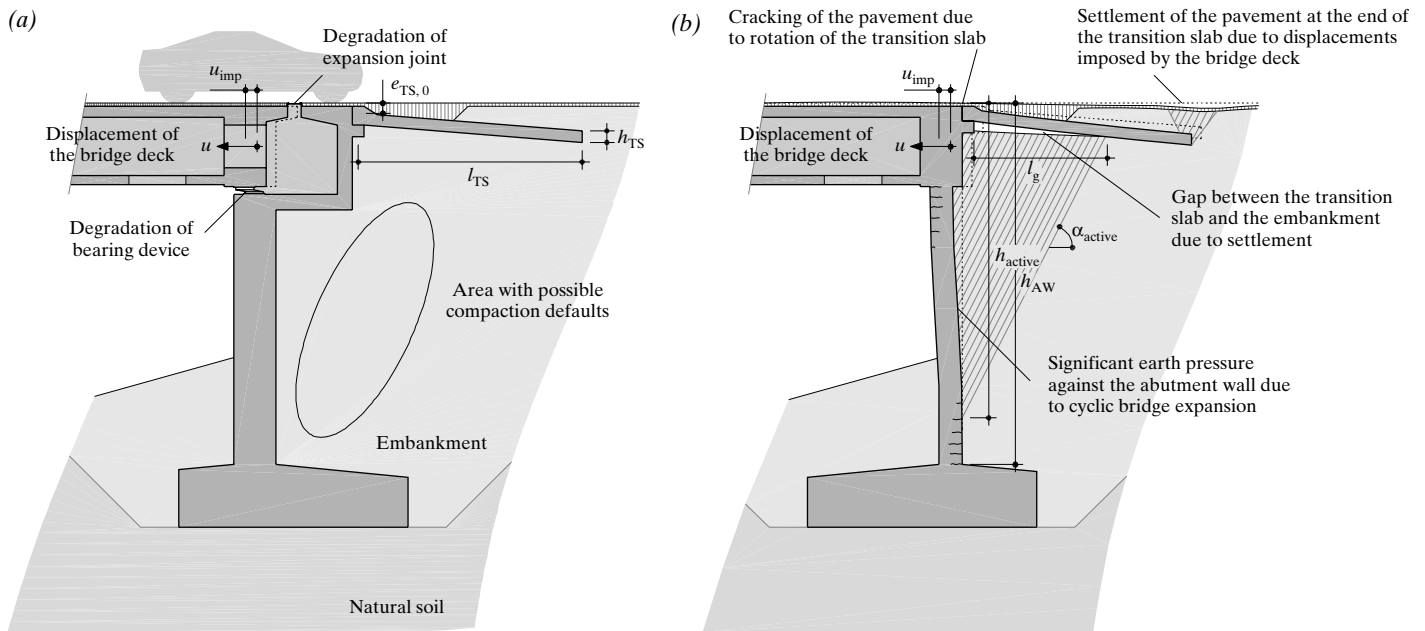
Phenomena caused by the longitudinal displacement of the bridge deck; (a) standard abutment with joints; (b) integral abutment
